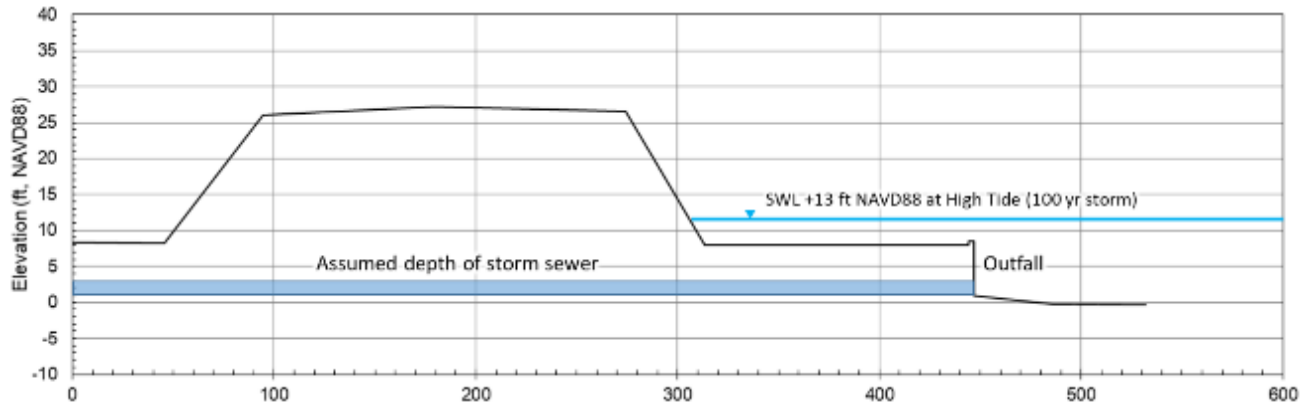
Storm sewer outfall near Long Wharf Drive Bridge under I-95 embankment (other outfalls similar)
